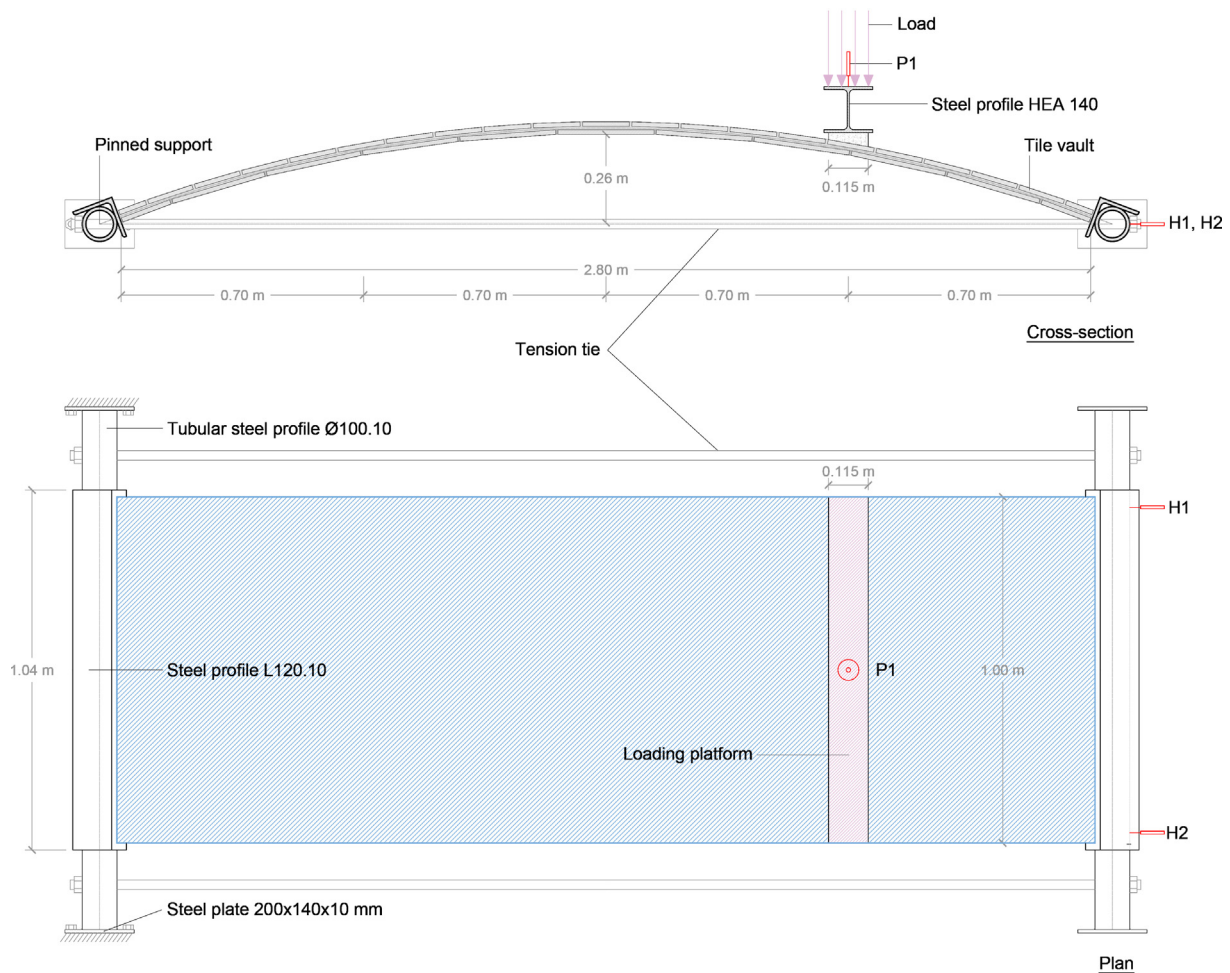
Setup of the monitoring and load test for the plain, unreinforced, tile vaults. Potentiometer indicated as P1, LVDTs indicated as H1 and H2. Up) cross section, down) plan.
